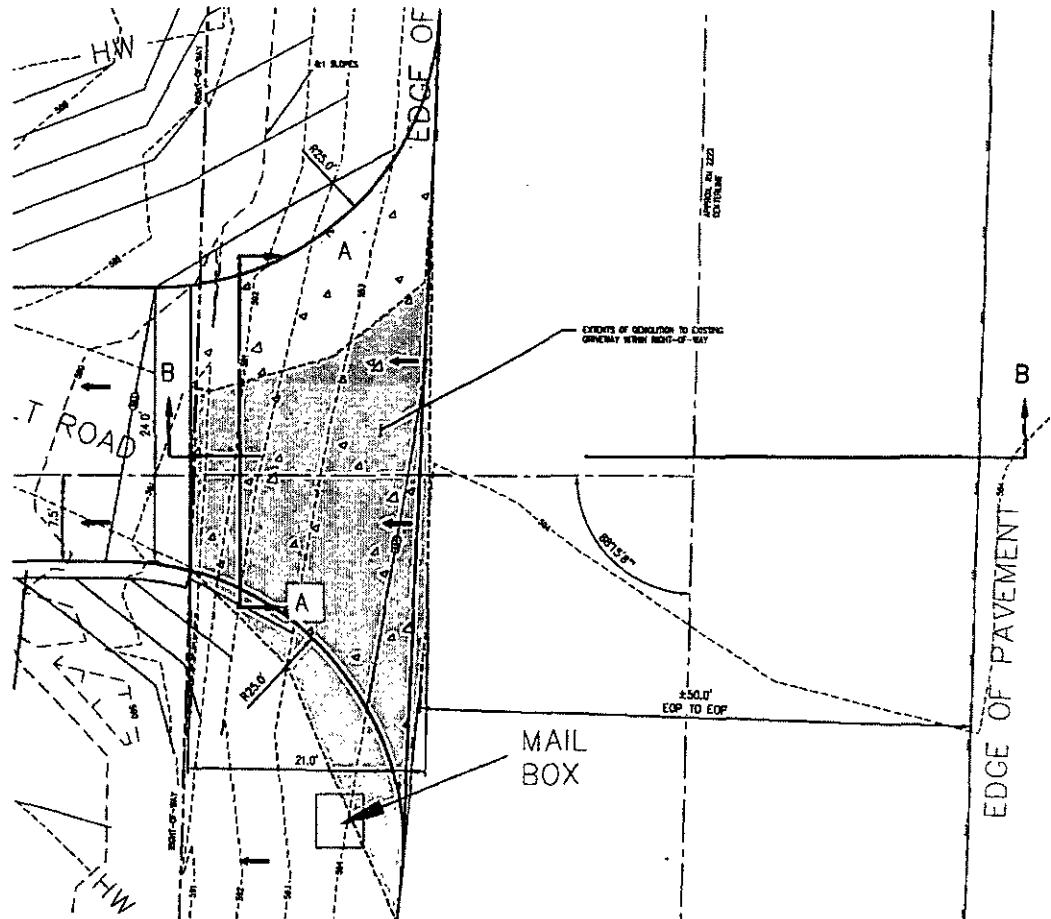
EXHIBIT M - DRIVEWAY DETAILS - (1 of 5)
